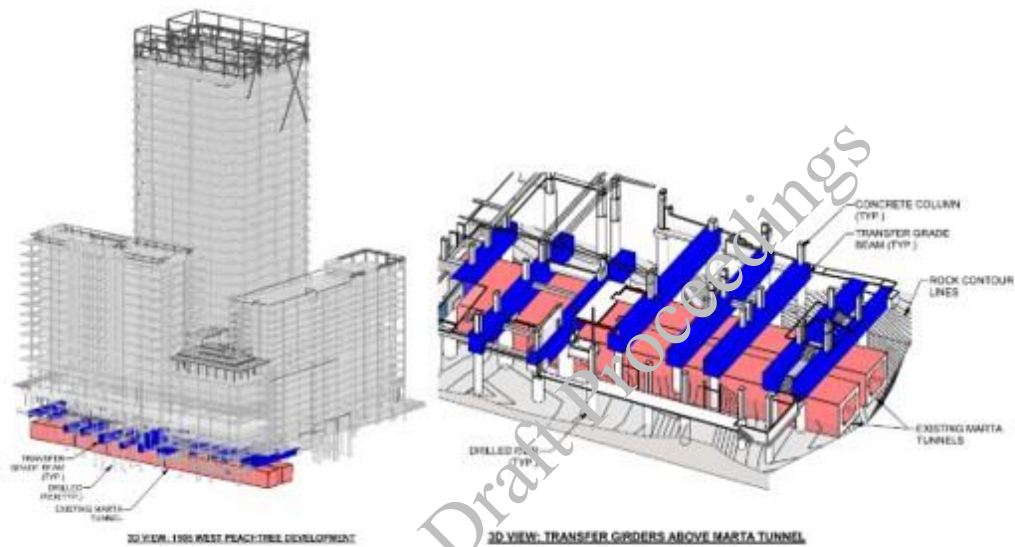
Use of Post-tensioned Transfer Girders to create large open spaces in a High-Rise Building
